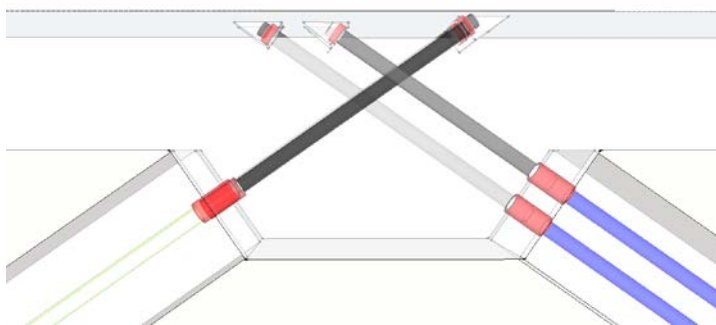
compressive strut-truss connection with straight anchorage bars
